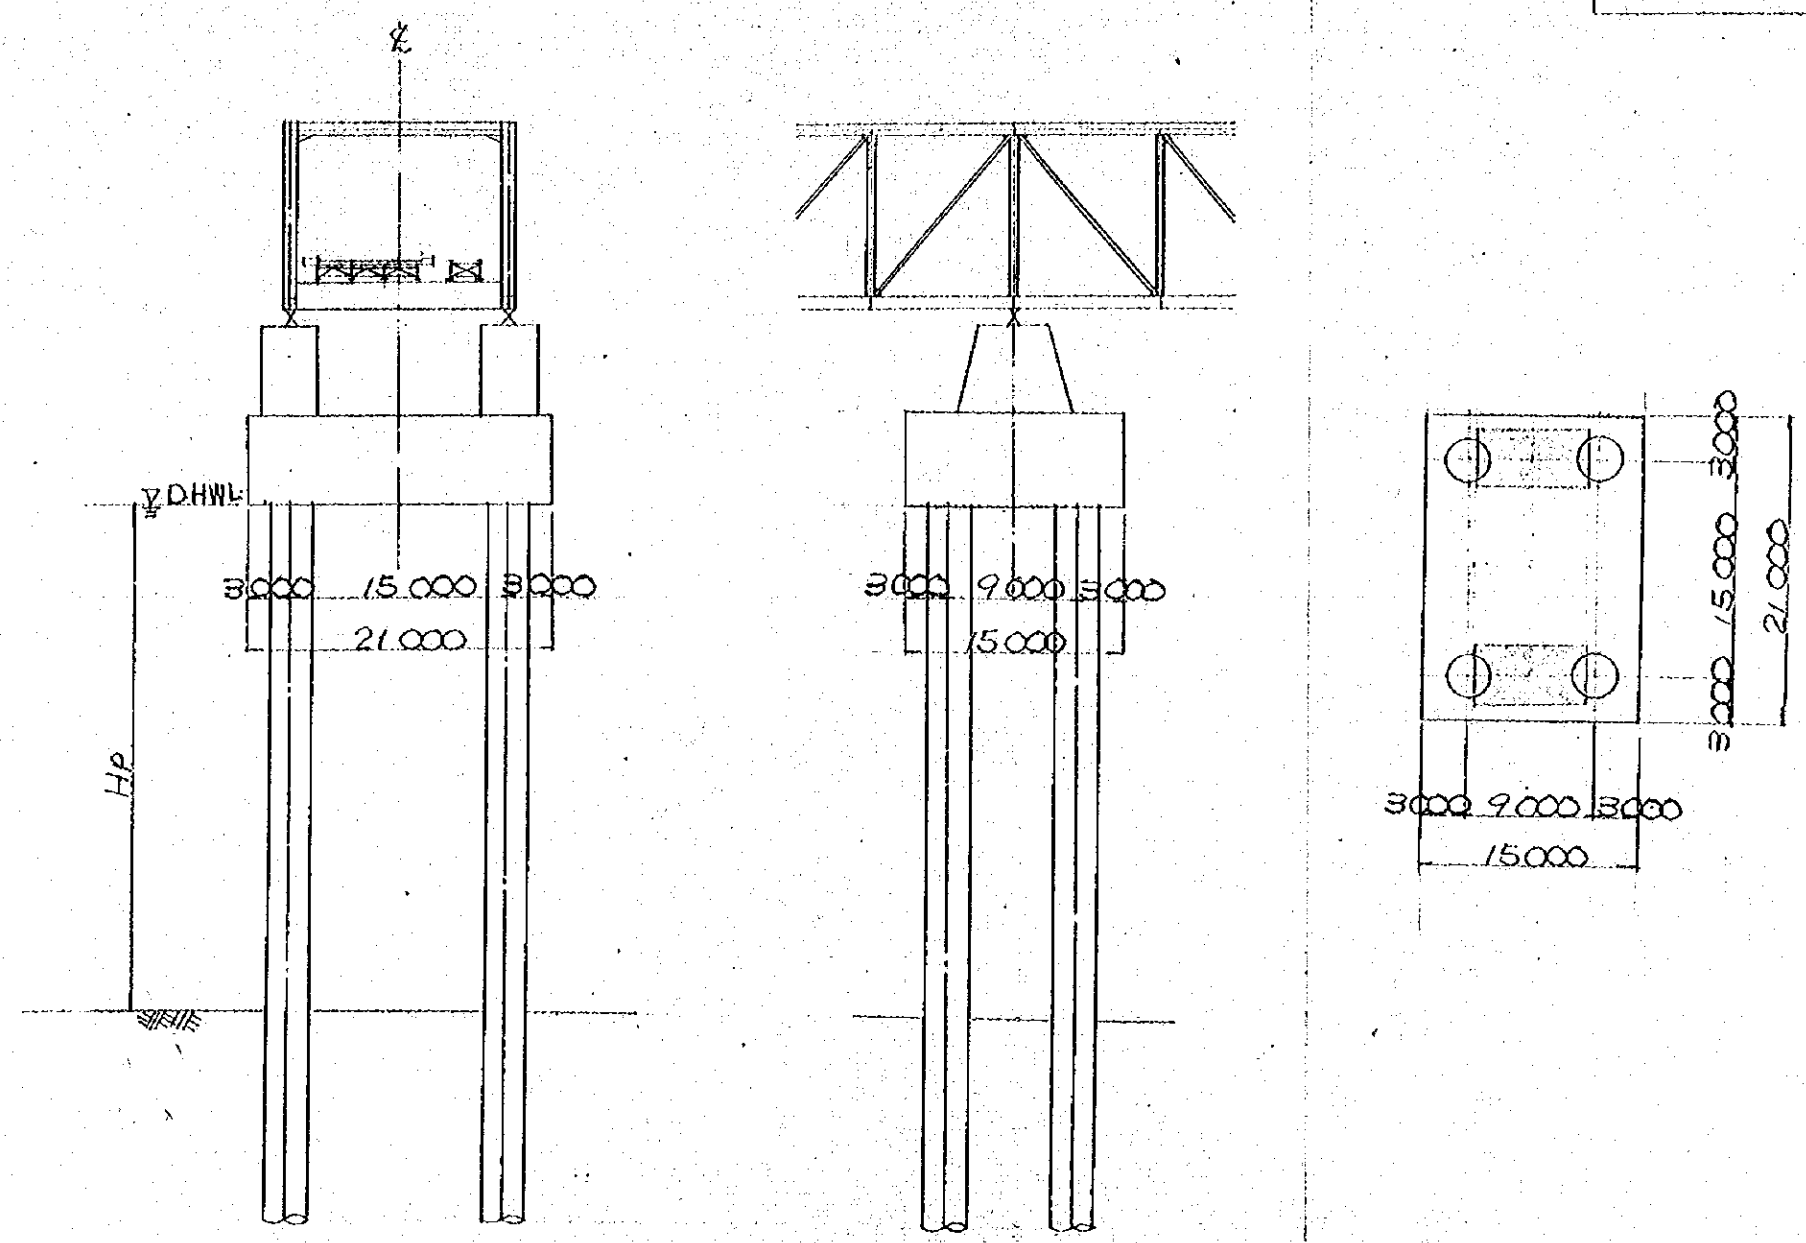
Outline of structure of multi-pile foundation.
